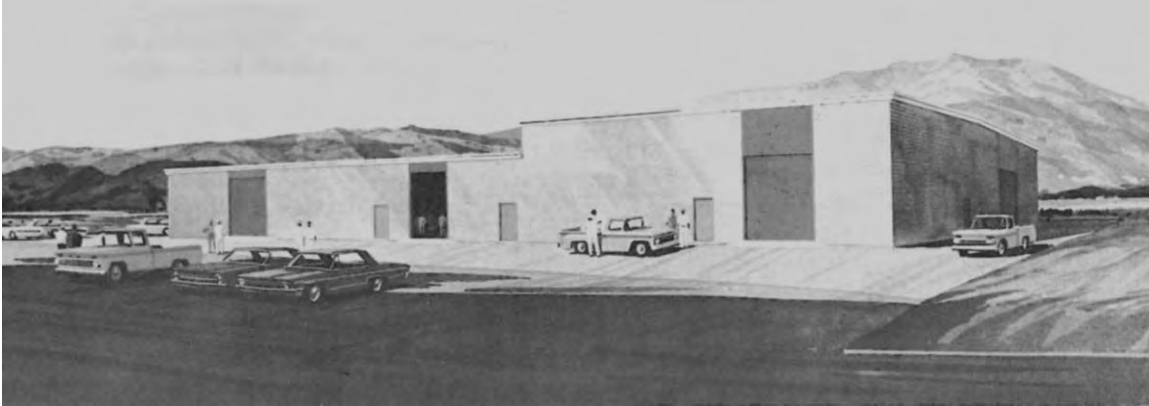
Architectural rendering of Building 23-710 (NTS News 2/26/1965)
